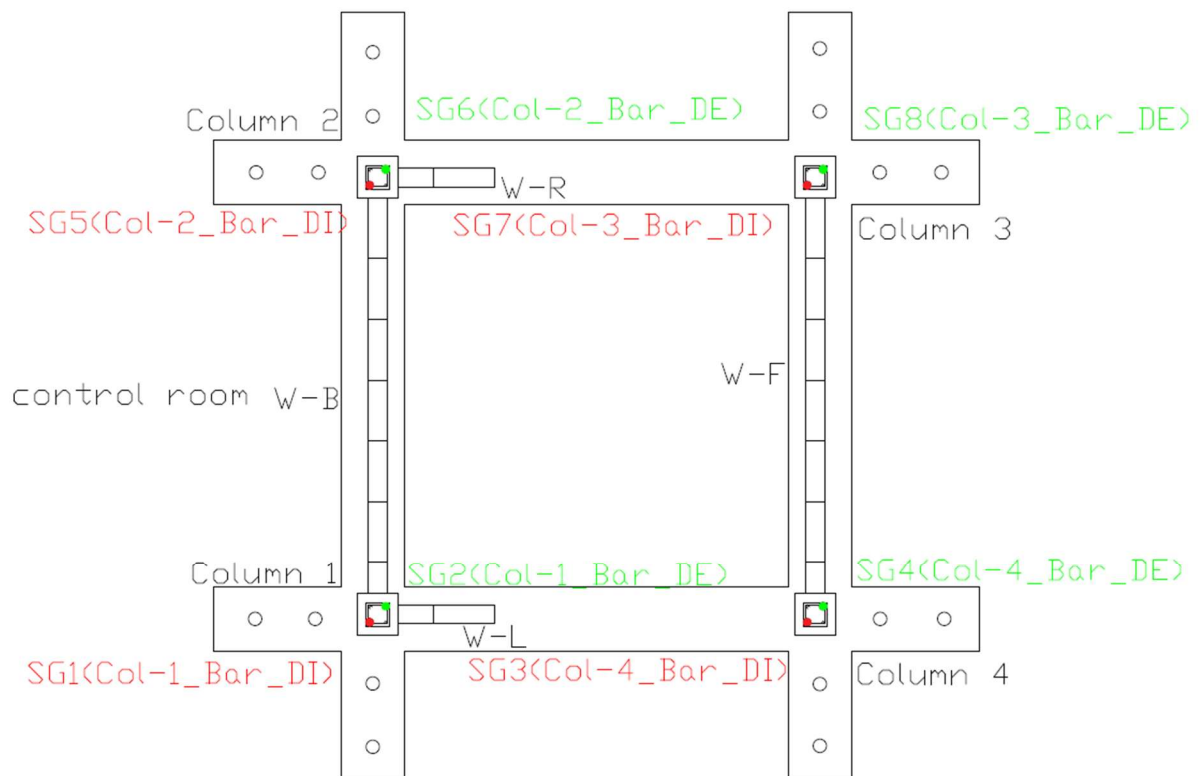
Floor plan with strain gauges at the bottom of the columns
